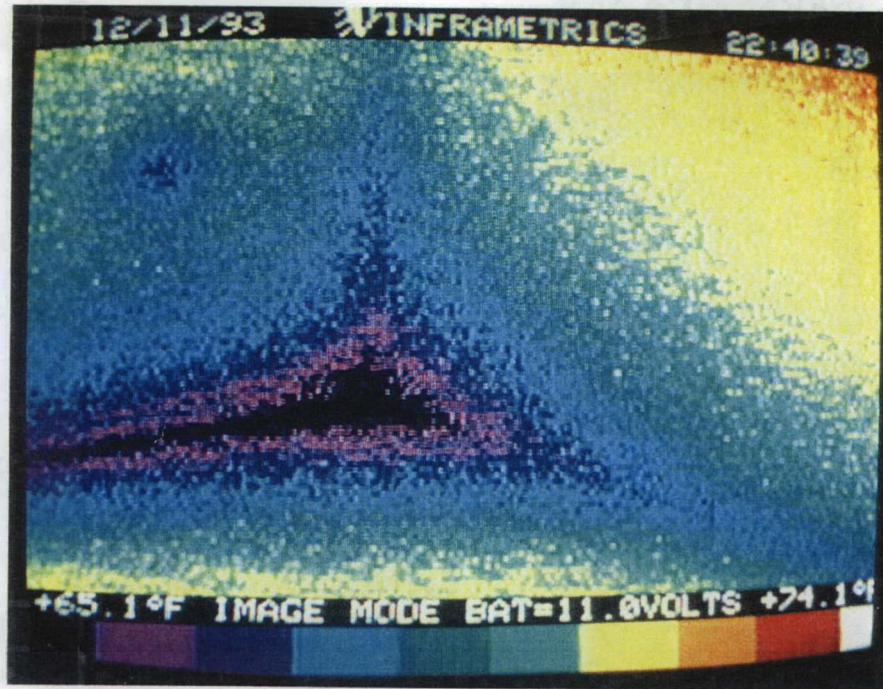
, Heat loss at joint of wall to roof, around fresh air vent, and around window Unit 4, 1 1/2 Story Open Panel Unit
